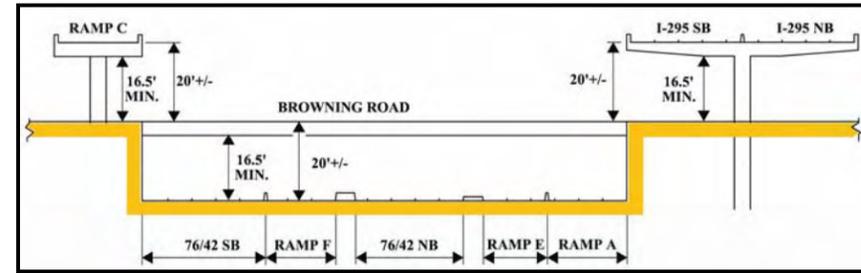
Section A-A at Browning Road (Alternative B)
